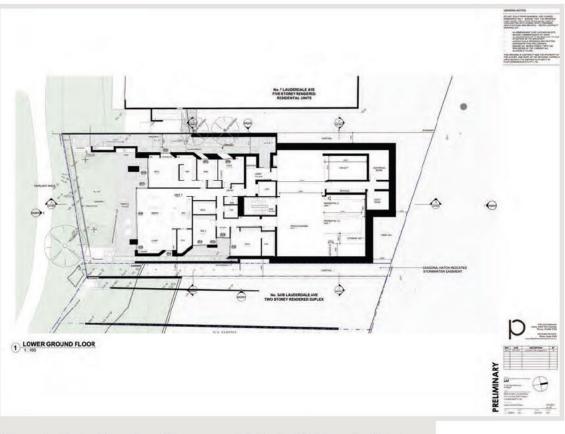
Typical floor plan of the proposed design by Platform Architects
